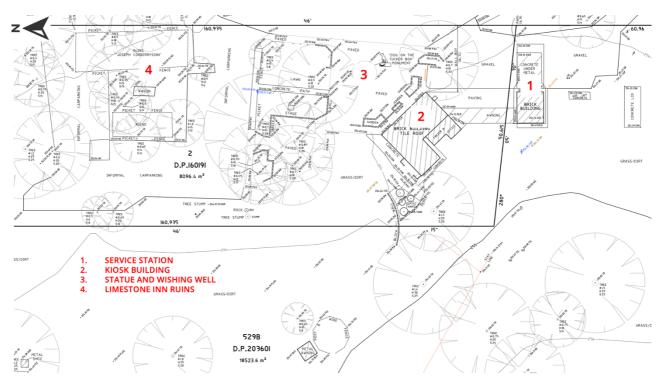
Extract of submitted site survey showing location of key areas and structures on the site
